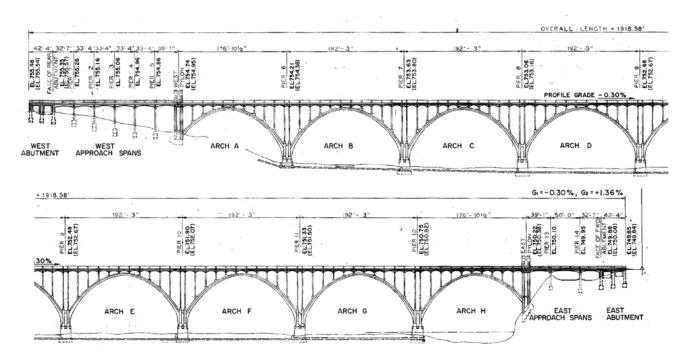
South Elevation of the Brookpark Road Bridge showing the span arrangements.
